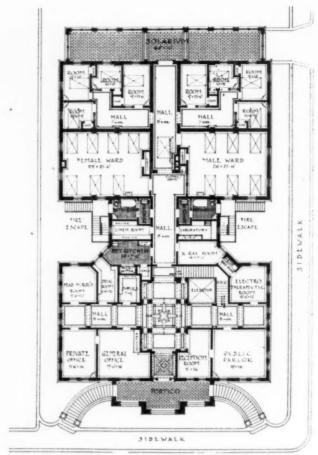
Baker Sanatorium, Charleston, S. C. First floor plan.
